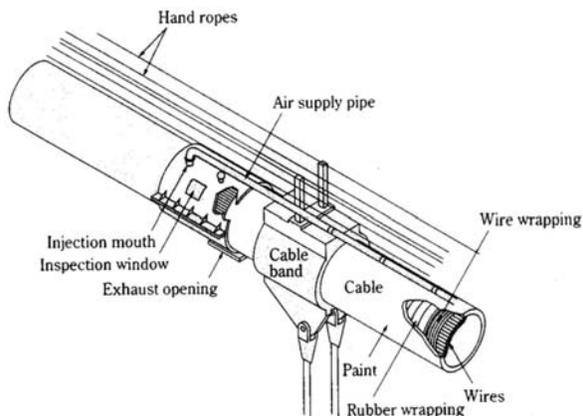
Schematic diagram of dry-air injection system (Figure obtained from “The Akashi Kaikyo Bridge”, a publication of the Honshu-Shikoku Bridge Authority)
